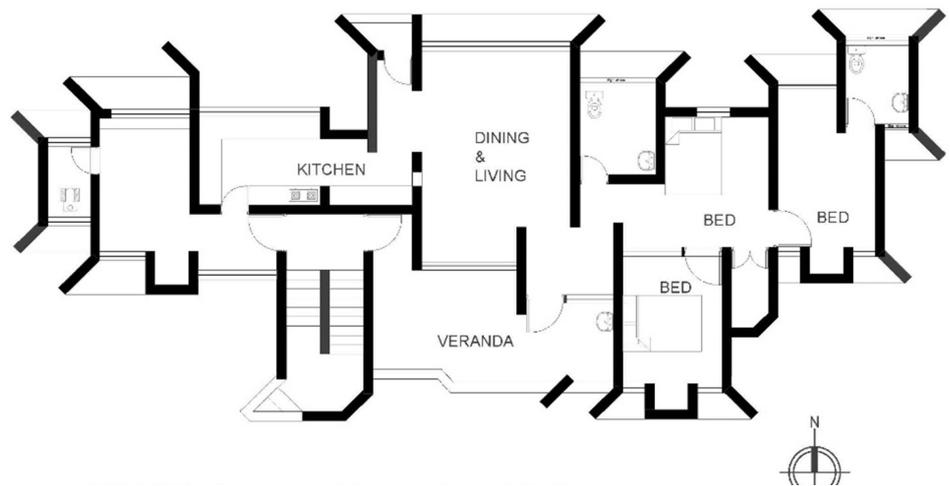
Type-plan for senior lecturers' quarters in a four-storied block of BAU staff flats, constructed ca, 1980s. Plan reconstructed by the first author from on-site sketch in 2019. Dimensions may not be accurate.
